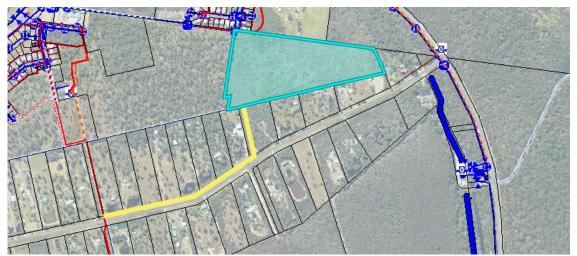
Proposed gravity fed sewer connection (yellow line - to be constructed)
